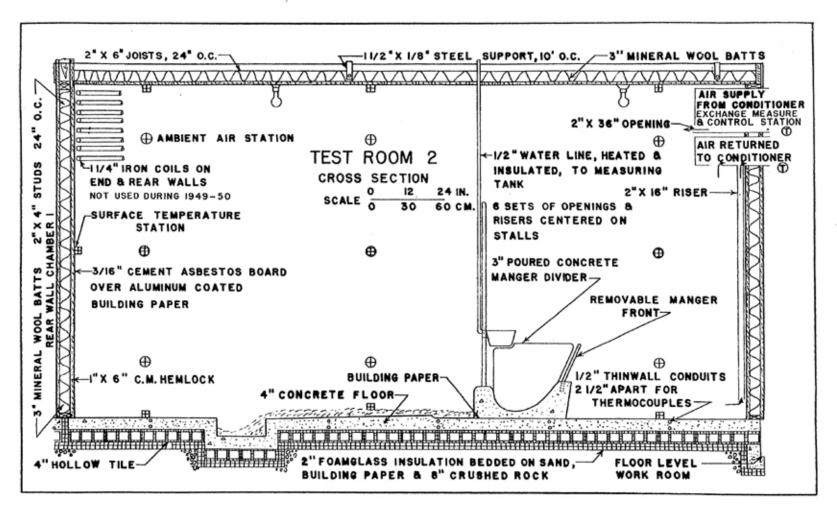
Arrangement and construction details of the test chambers. Outer walls and upper ceiling of work room are not shown. Animals remained inside these chambers throughout test periods, except while being weighed.
